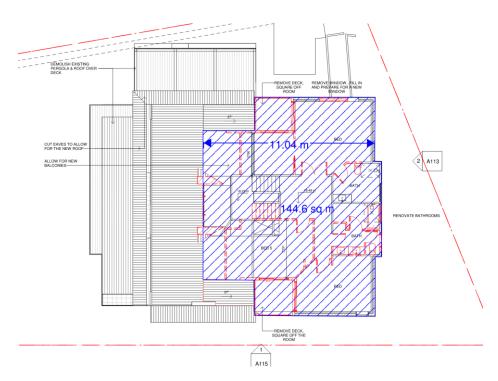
existing floorplate of the upper building level; the floor plate is 11m deep and approx. $144m^2$ in area
